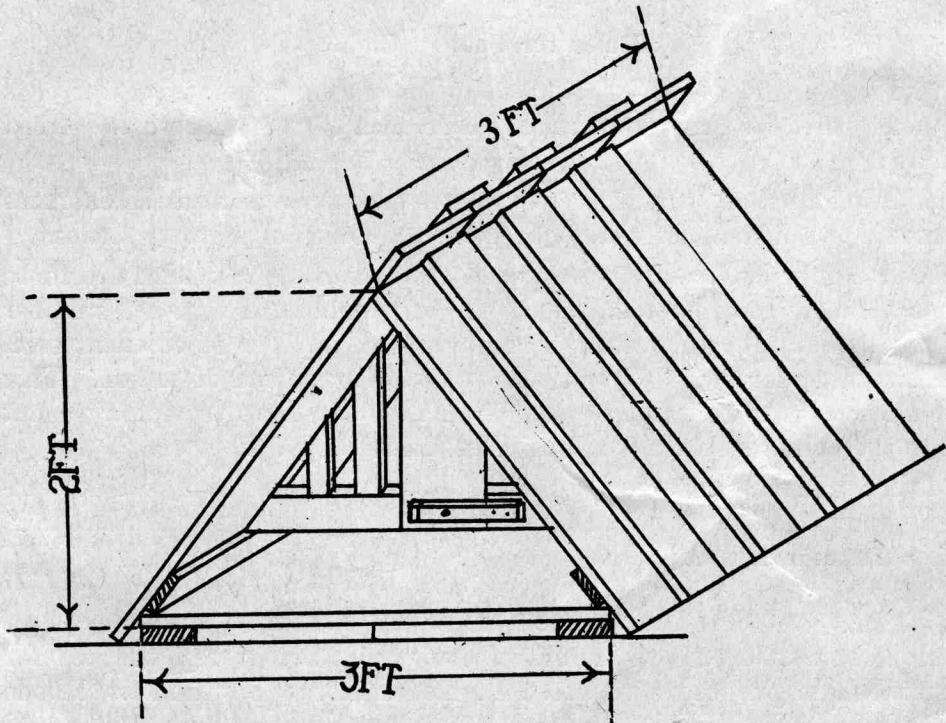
Home-made Brood Coop.* Dimensions: Floor 3 ft. by 3 ft. Boards nailed to two pieces of studding to raise floor from ground. Short side of roof is 2 ft. 8 inches by 3 ft. Long side of roof is 3 ft. by 3 ft. Sides of roof are nailed at top, making an A-shaped coop. Boards are nailed crosswise. Coop is made to fit down closely over floor. Front is slatted up and down. Floor is portable, thus being easily cleaned.
